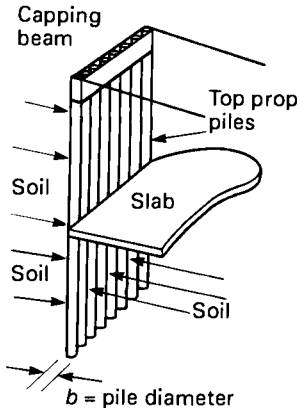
Use of a piled wall as a barrette to carry vertical loading
